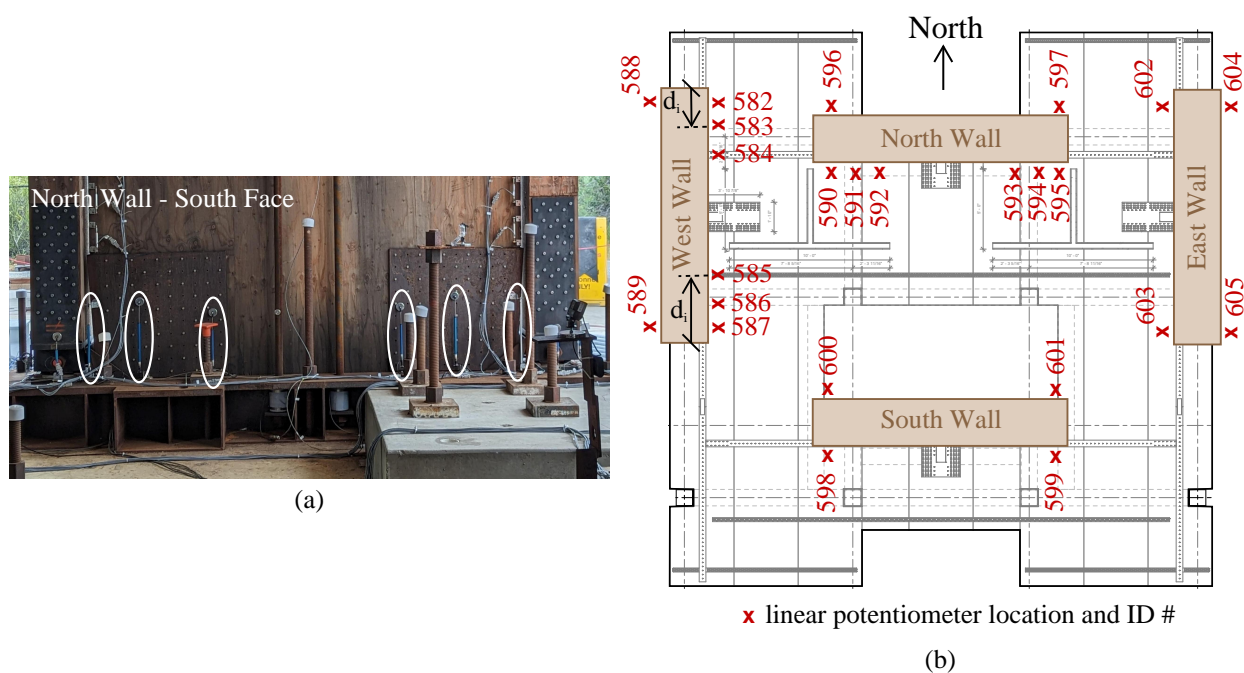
Linear potentiometers measuring wall uplift (a) example photo of instruments and (b) schematic showing locations of all wall uplift linear potentiometers
